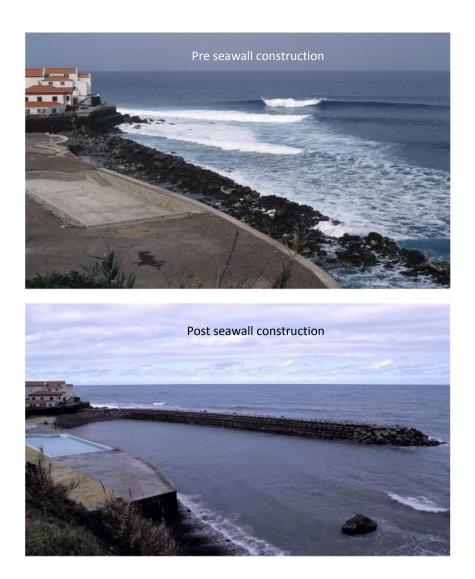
Photos showing the destruction of the wave at Ponta Delgada on the island of Madeira, Portugal. The top photo shows the wave prior to the construction of the seawall and the bottom photo shows how the wave has been affected post seawall construction. The pool that the seawall was built to protect is can be seen to the left in each photo. Photos from Henry, (2011).
